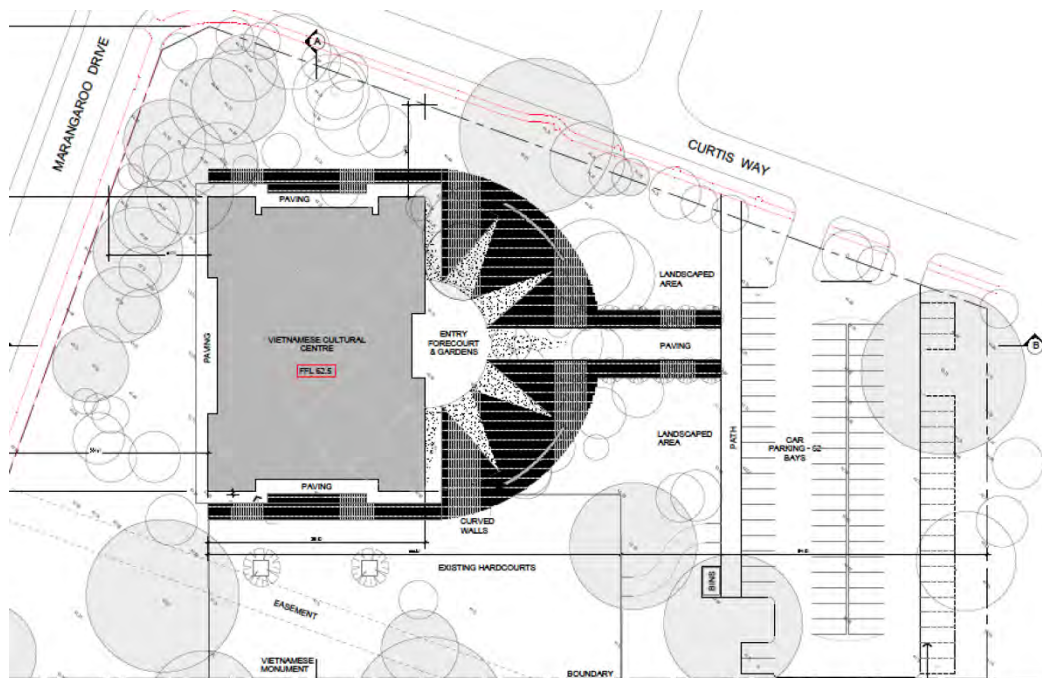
Proposed Vietnamese Cultural Centre Site Plan
